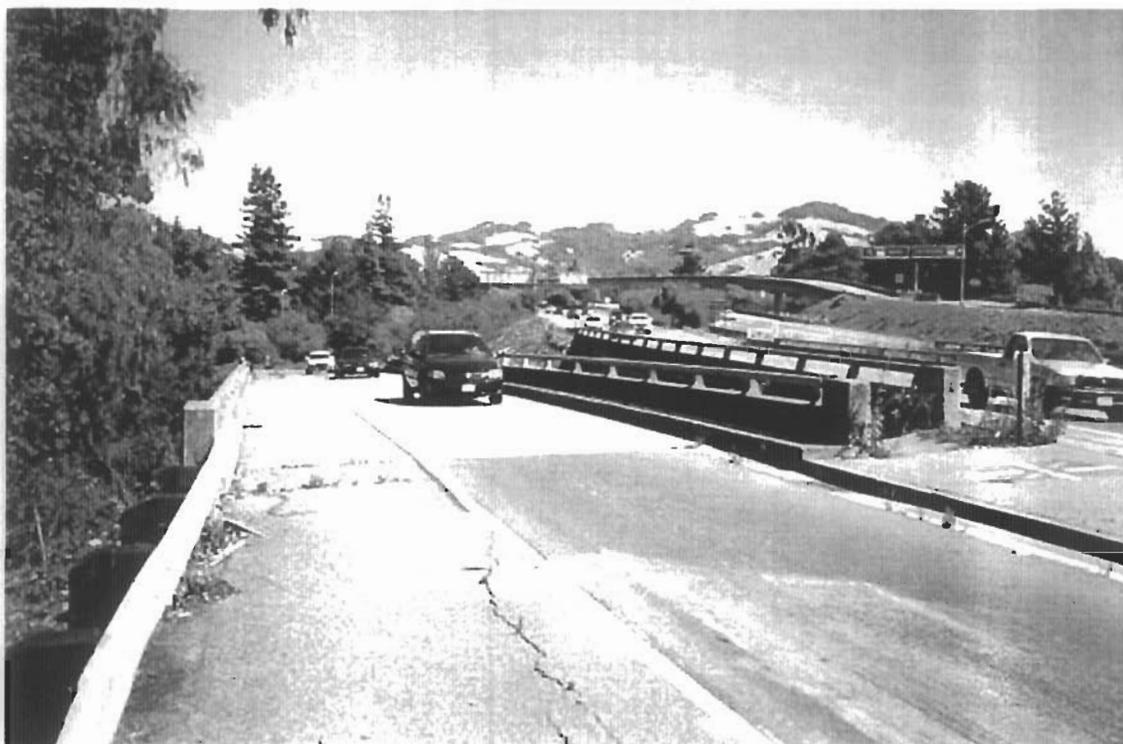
On ramp to south bound lane for Santa Rosa Creek overcrossing. Samples were obtained from vertical and horizontal structures seen on the left side of this picture.
